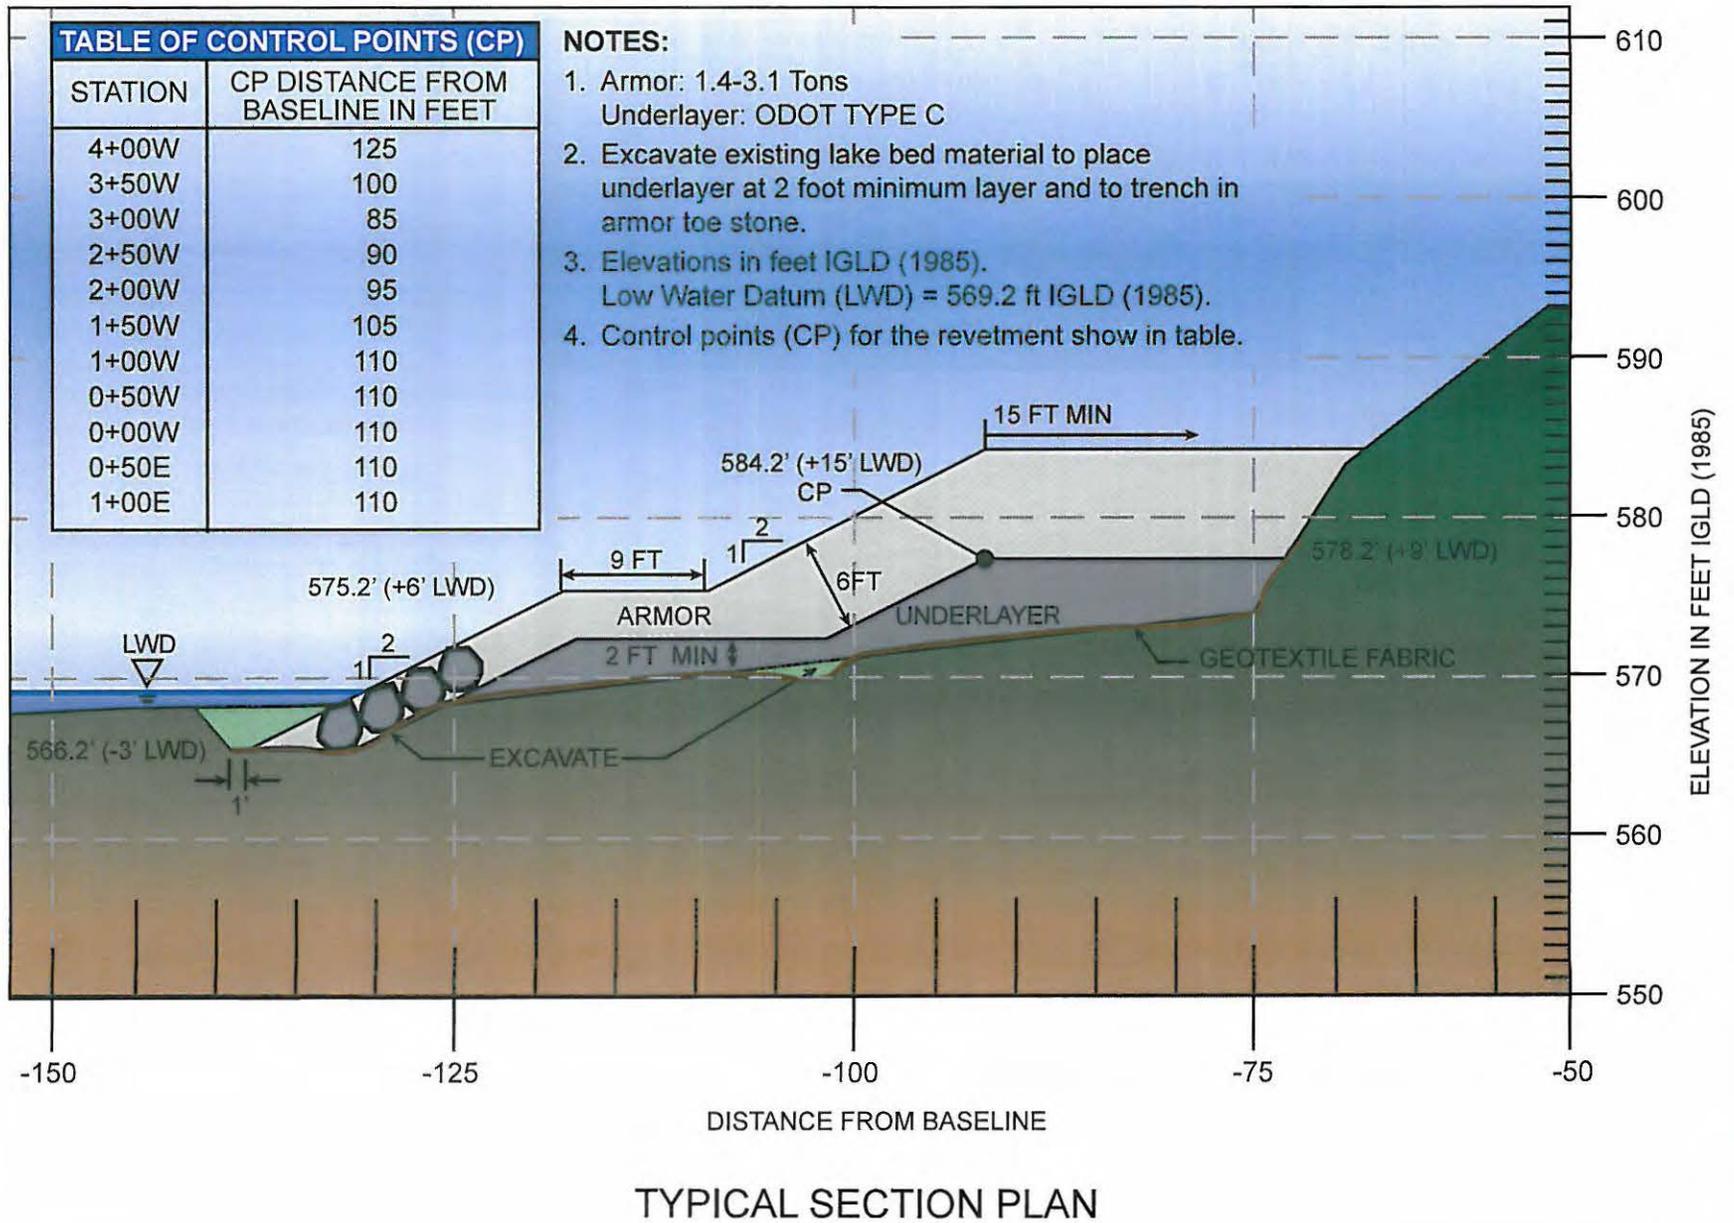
Alternative 2 - Typical Cross Section of Stone Revetment.
